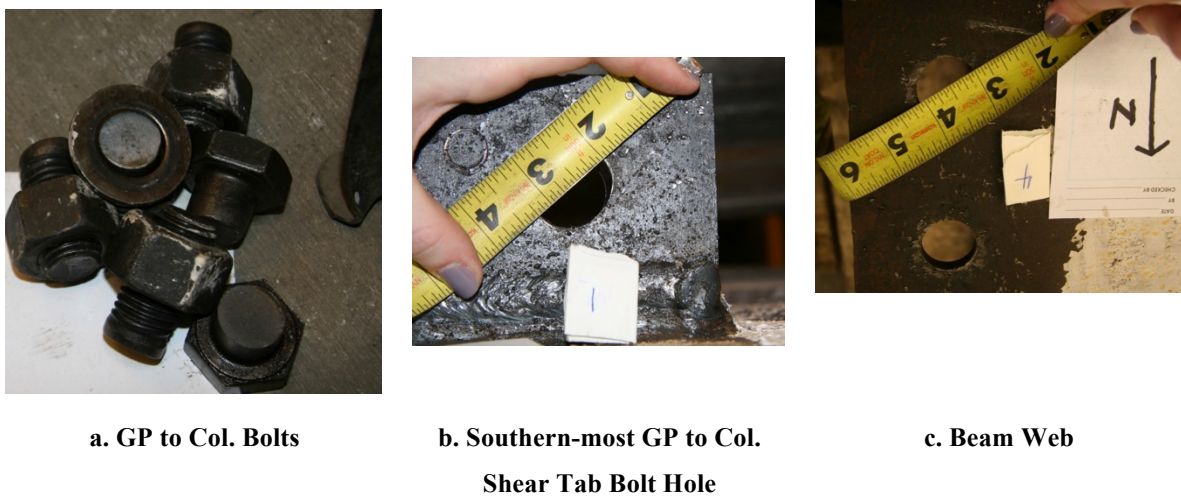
Photo Evidence of Bolt Damage in NE Corner
